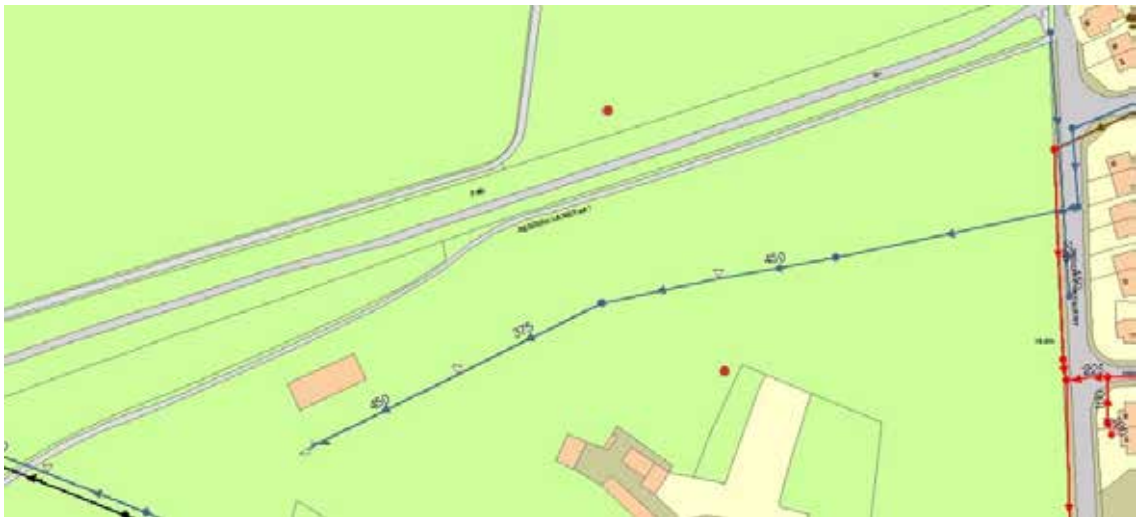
Surface water drain crossing the site shown as blue line. Existing foul sewer shown as red line – source United Utilities searches.
